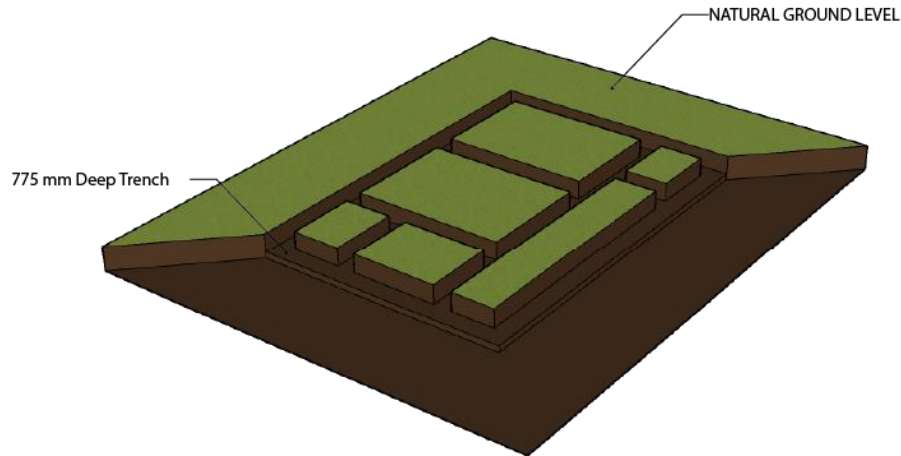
Foundation Trenches (For details, refer page 22)
